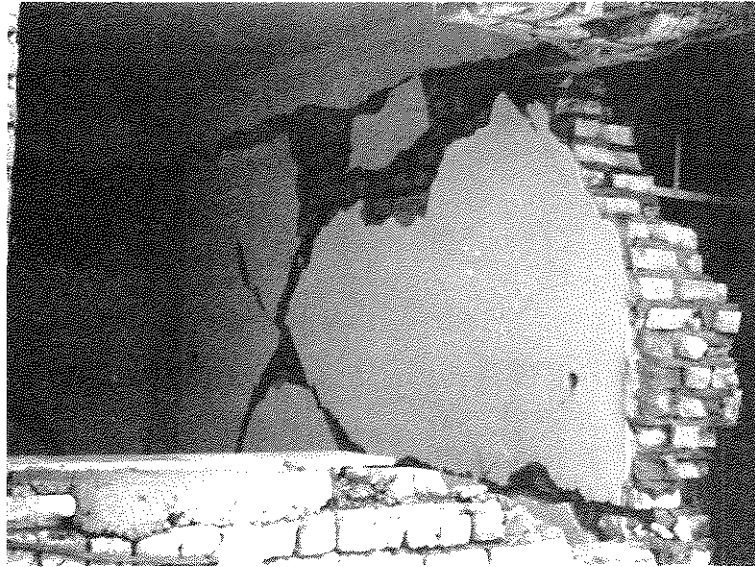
Major damage to buildings with extensive amount of unreinforced shear walls
